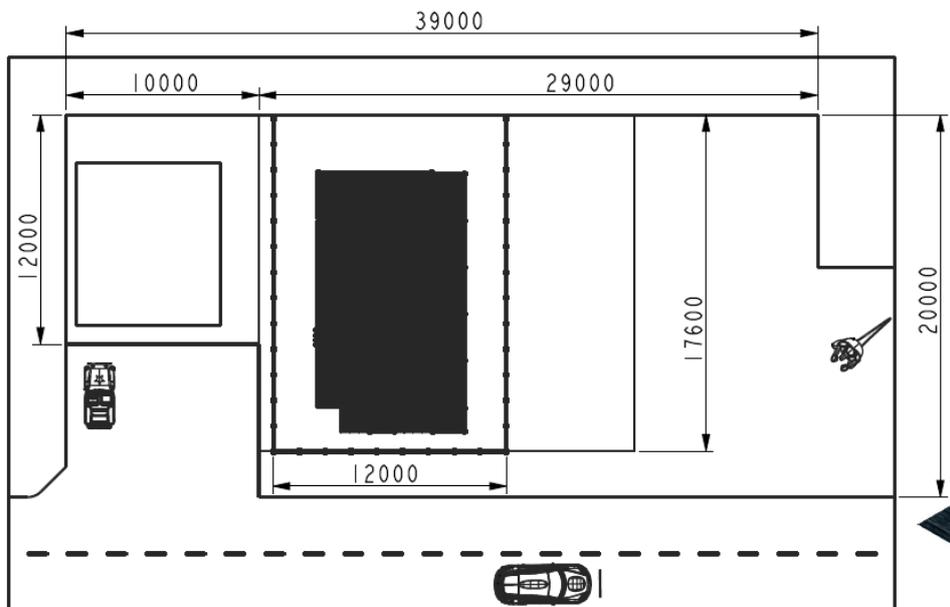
Proposed WBCT OPS unit layout (Source: Port Authority, 2024)
